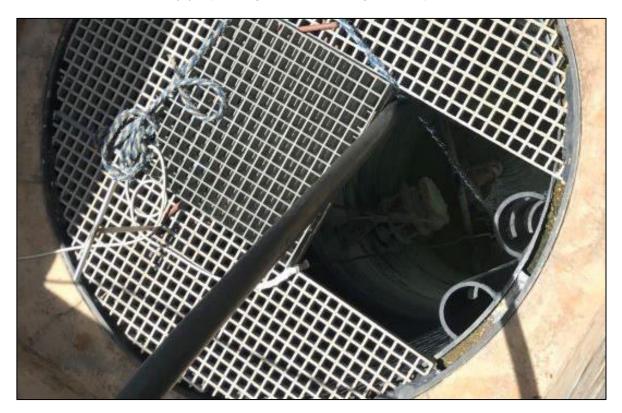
Pond 1 pipe outlets into HDPE sump
